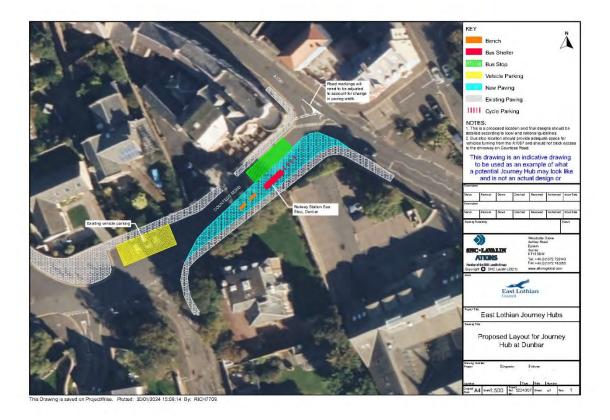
Indicative drawing of Dunbar Station/High Street Hub
